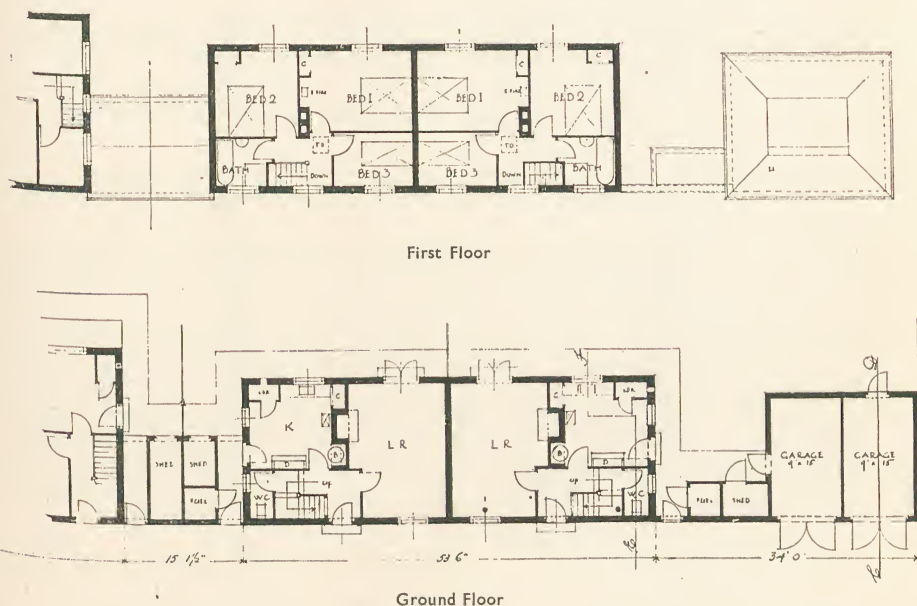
C.—PLANS OF HOUSES 9 AND 10, PARKWAY, WELWYN GARDEN CITY
